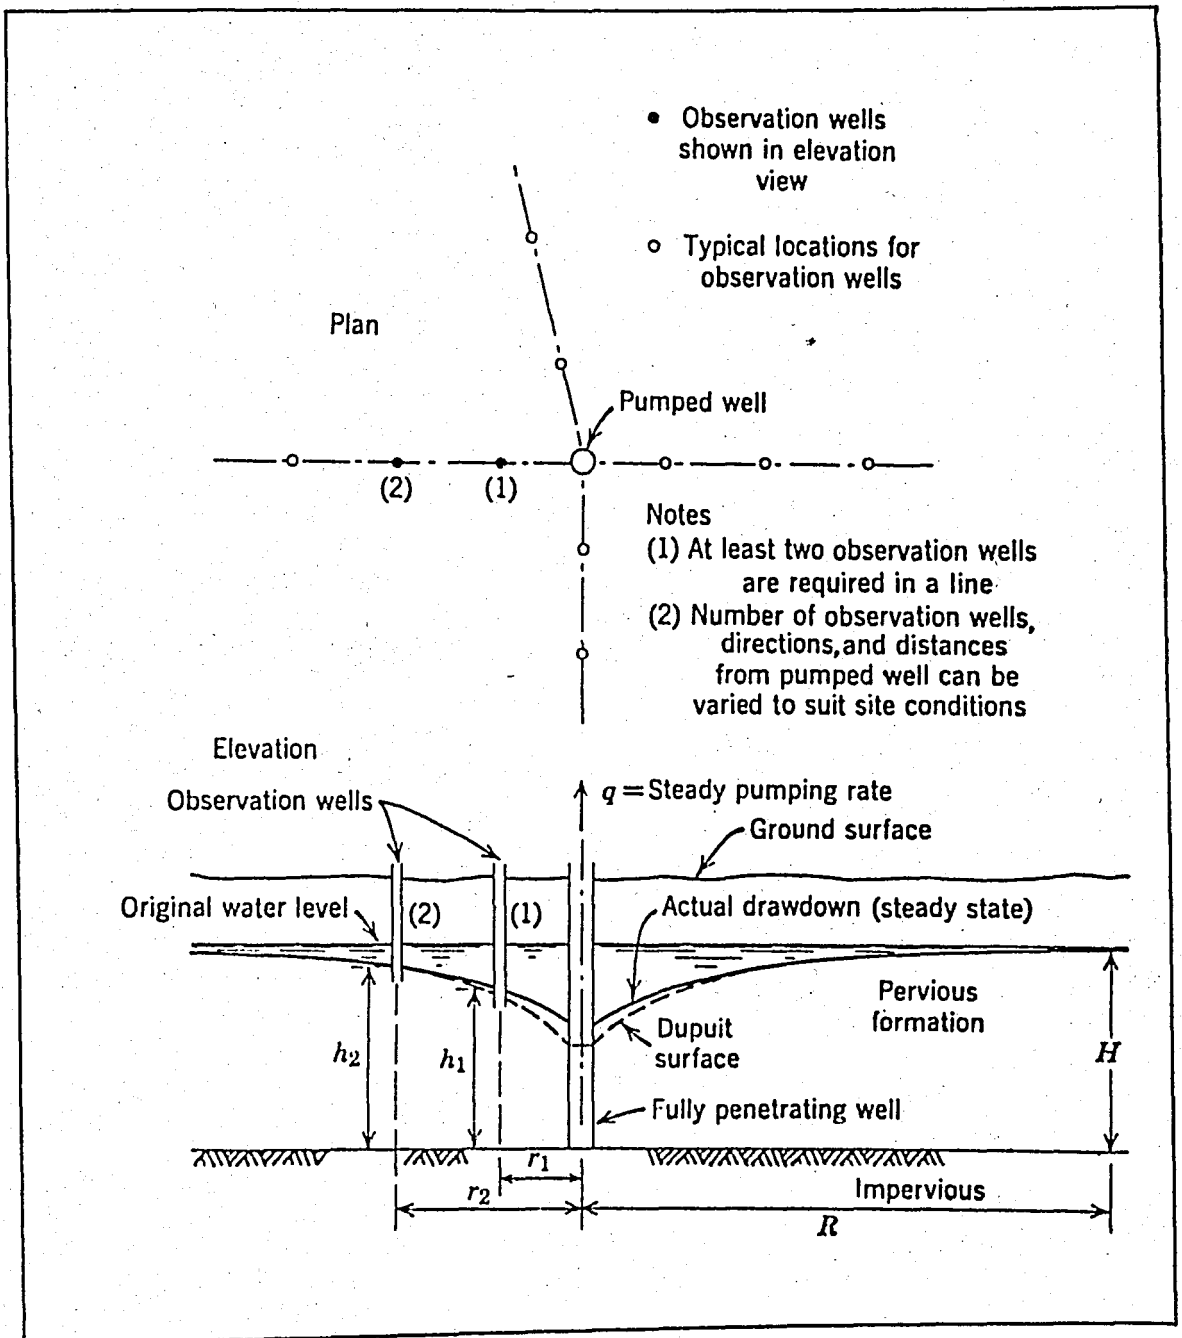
TYPICAL ARRANGEMENTS FOR DETERMINING PERMEABILITY BY WELL- PUMPING TEST
